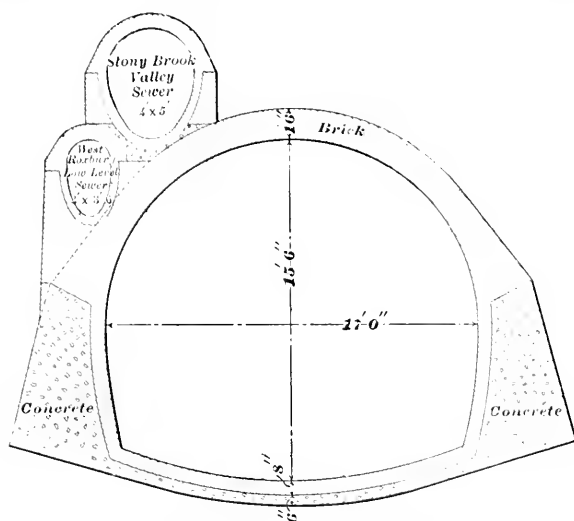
CROSS-SECTION OF STONY BROOK CONDUIT NEAR BOYLSTON STREET STATION.
